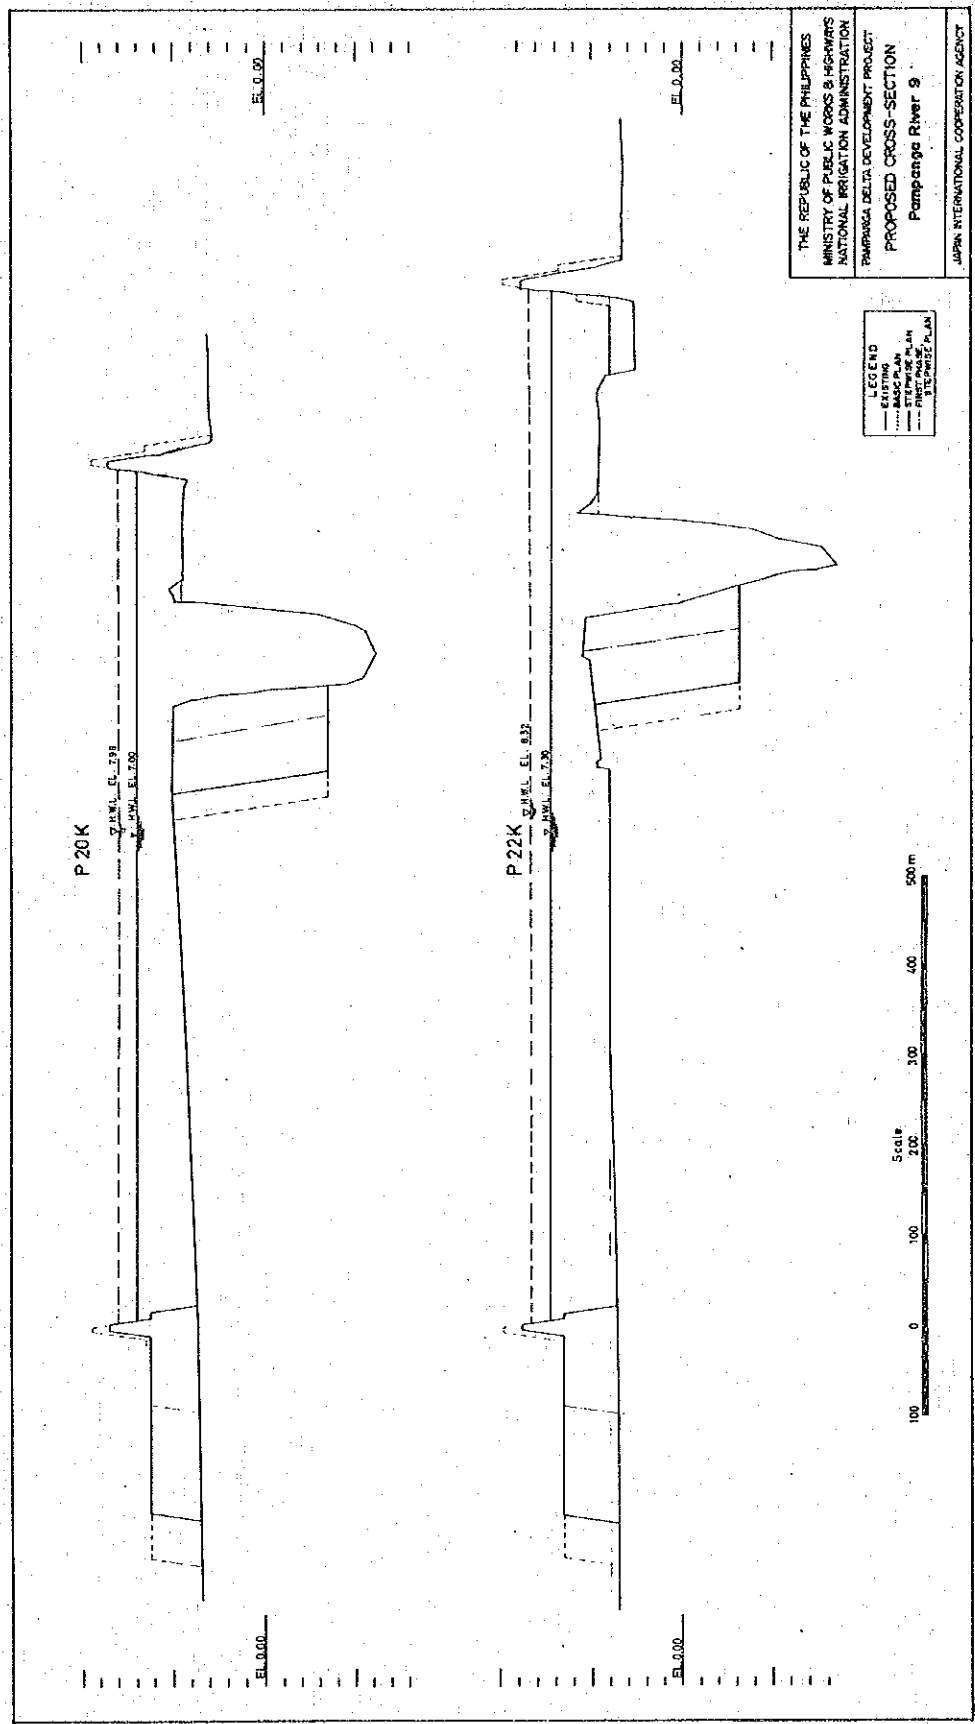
(10) PROPOSED CHANNEL CROSS-SECTION
